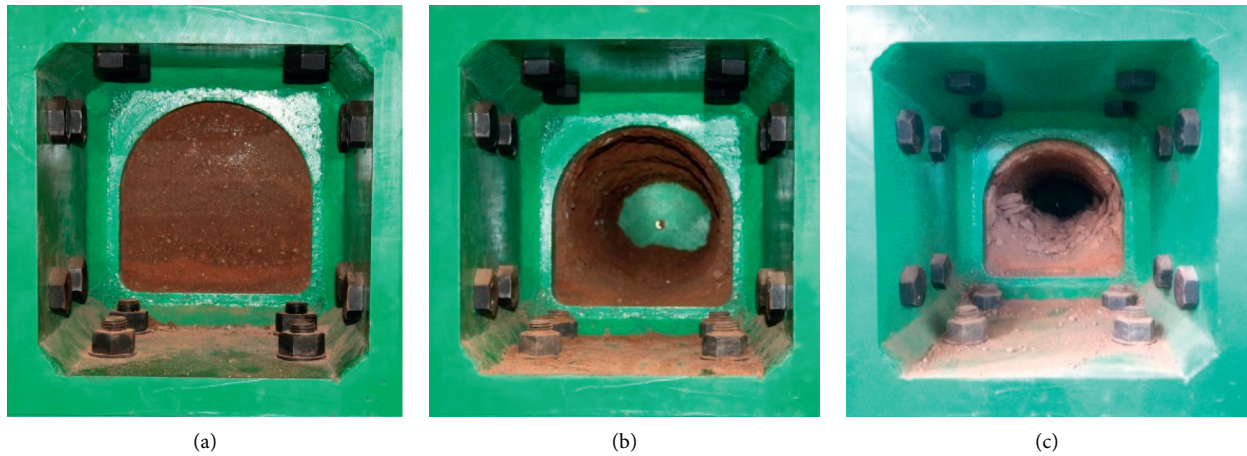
Failure characteristics before and after roadway excavation. (a) Before roadway excavation. (b) Initial stages of roadway excavation. (c) Late stages of roadway excavation.
